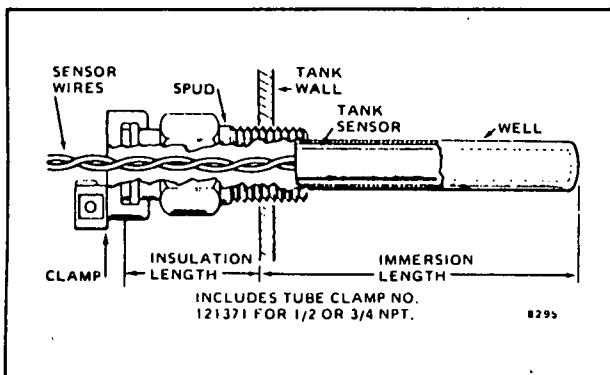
TANK SENSOR INSERTED IN IMMERSION WELL.
